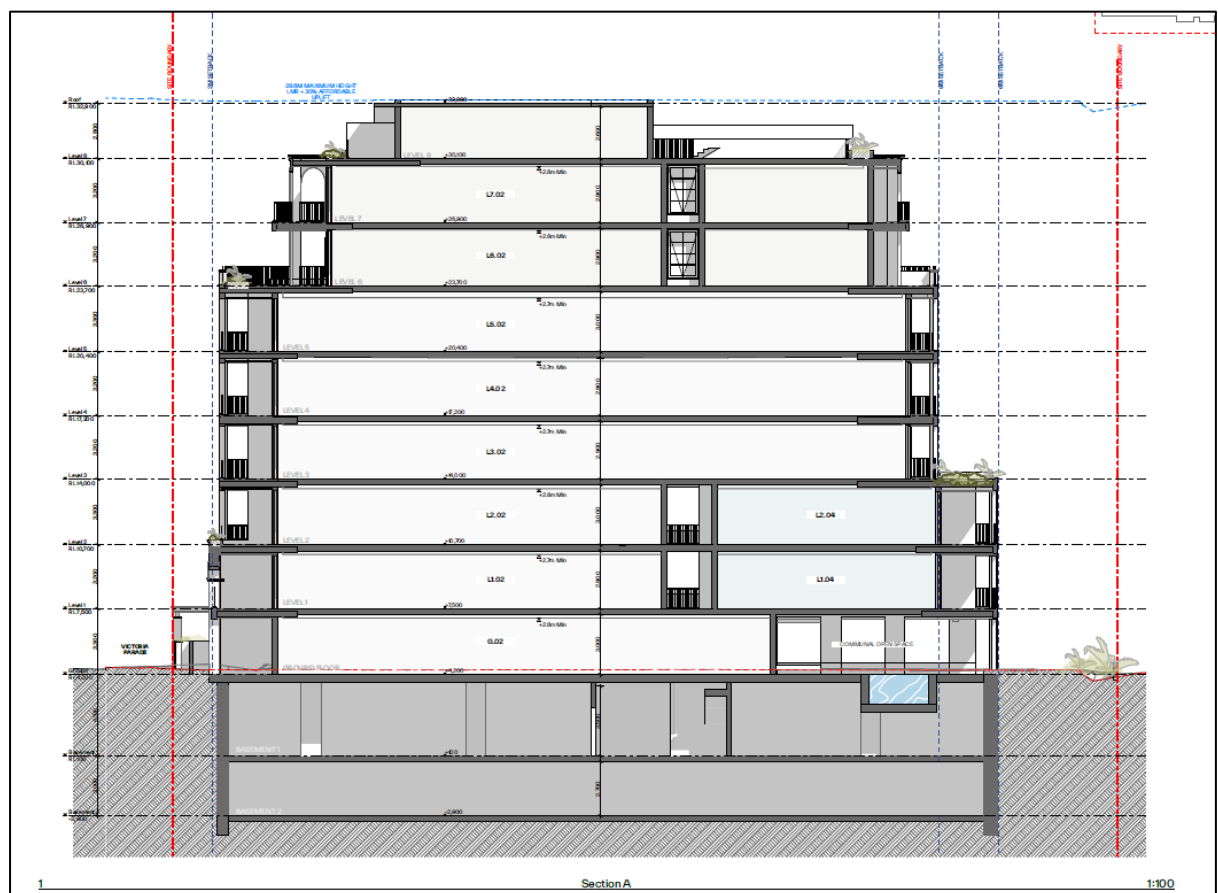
Proposed Long Section (Source: PBD Architects, 2026)
